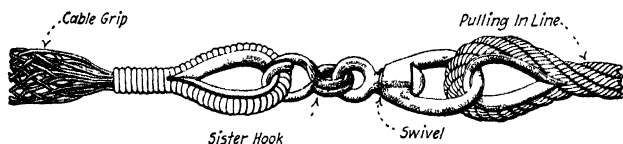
Swivel sister hooks used for attaching pulling-in line to a cable grip. (Universal Cable Grip Co., Syracuse, N. Y.)
